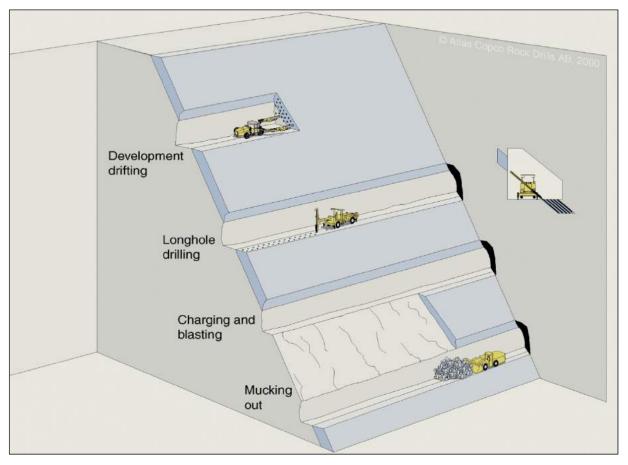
The proposed longhole open stoping mining method (Atlas Copco)
